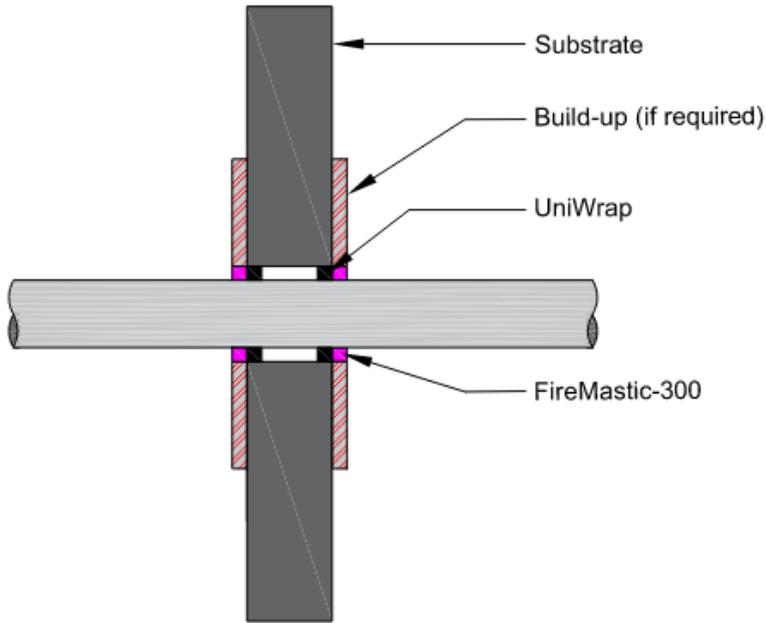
Typical installation of pipes fitted perpendicular to wall with build-up and BOSS UniWrap on both faces
